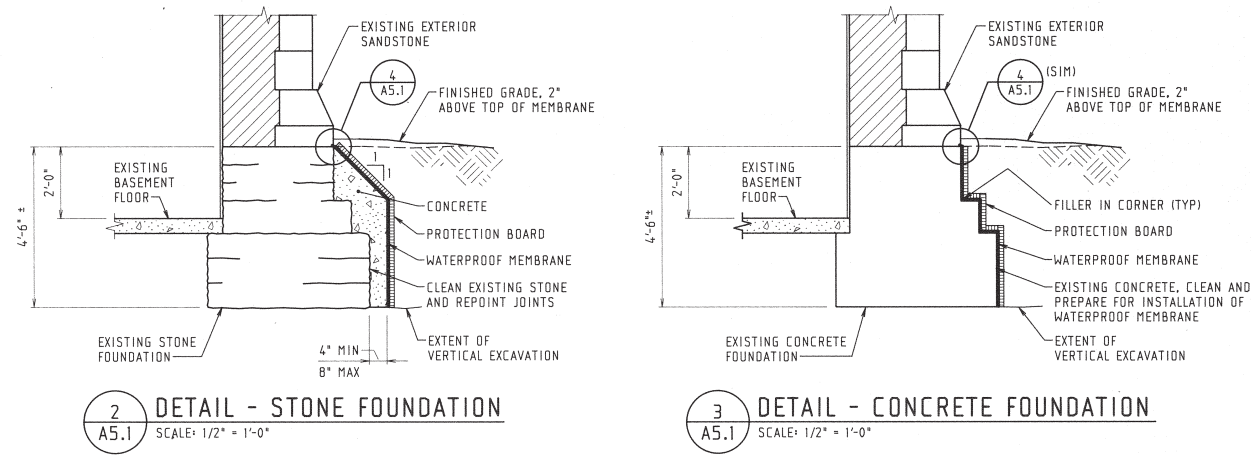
Detail from the 1994 Masonry Preservation, Storm Drainage Repair and Building Lighting
